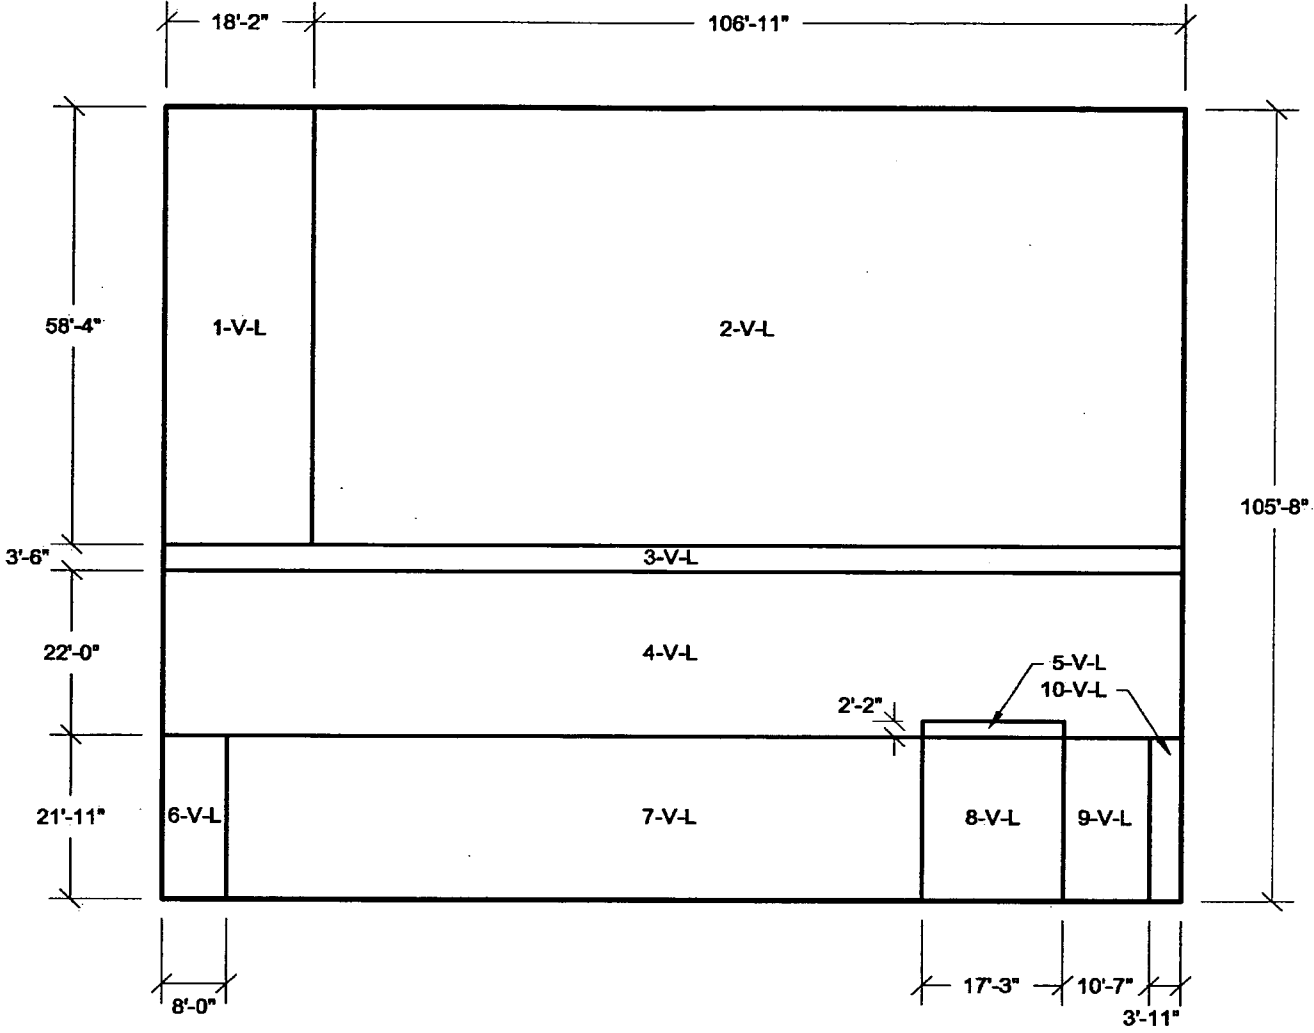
H.3-23: WEST WALL LOOKING EAST
